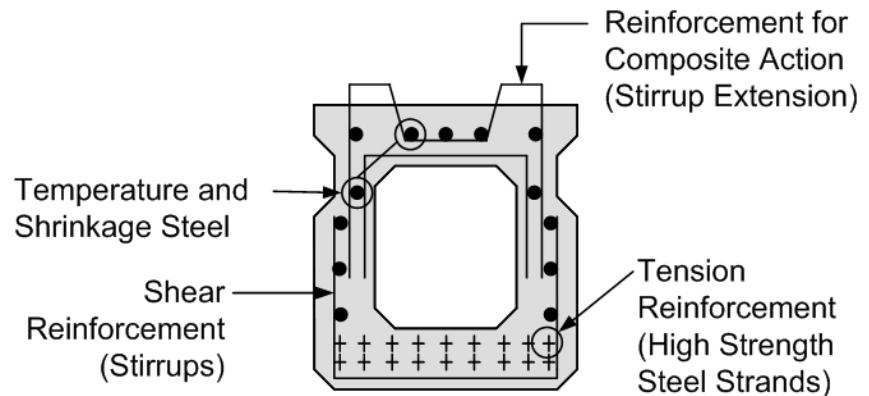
Typical Prestressed Box Beam Reinforcement
